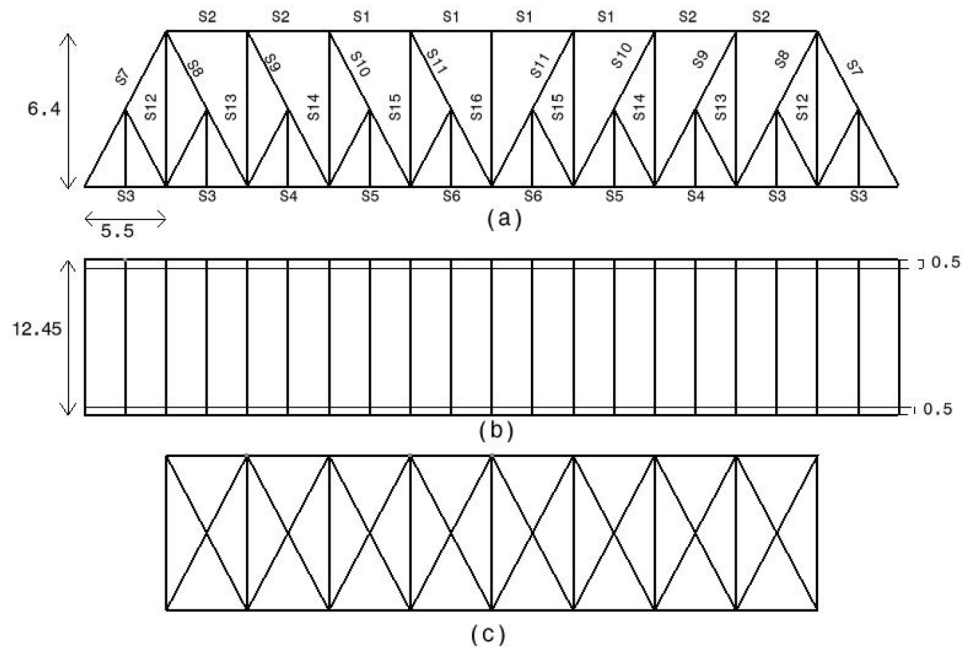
Elevation of Pasakha Bridge; a left truss and b right truss
